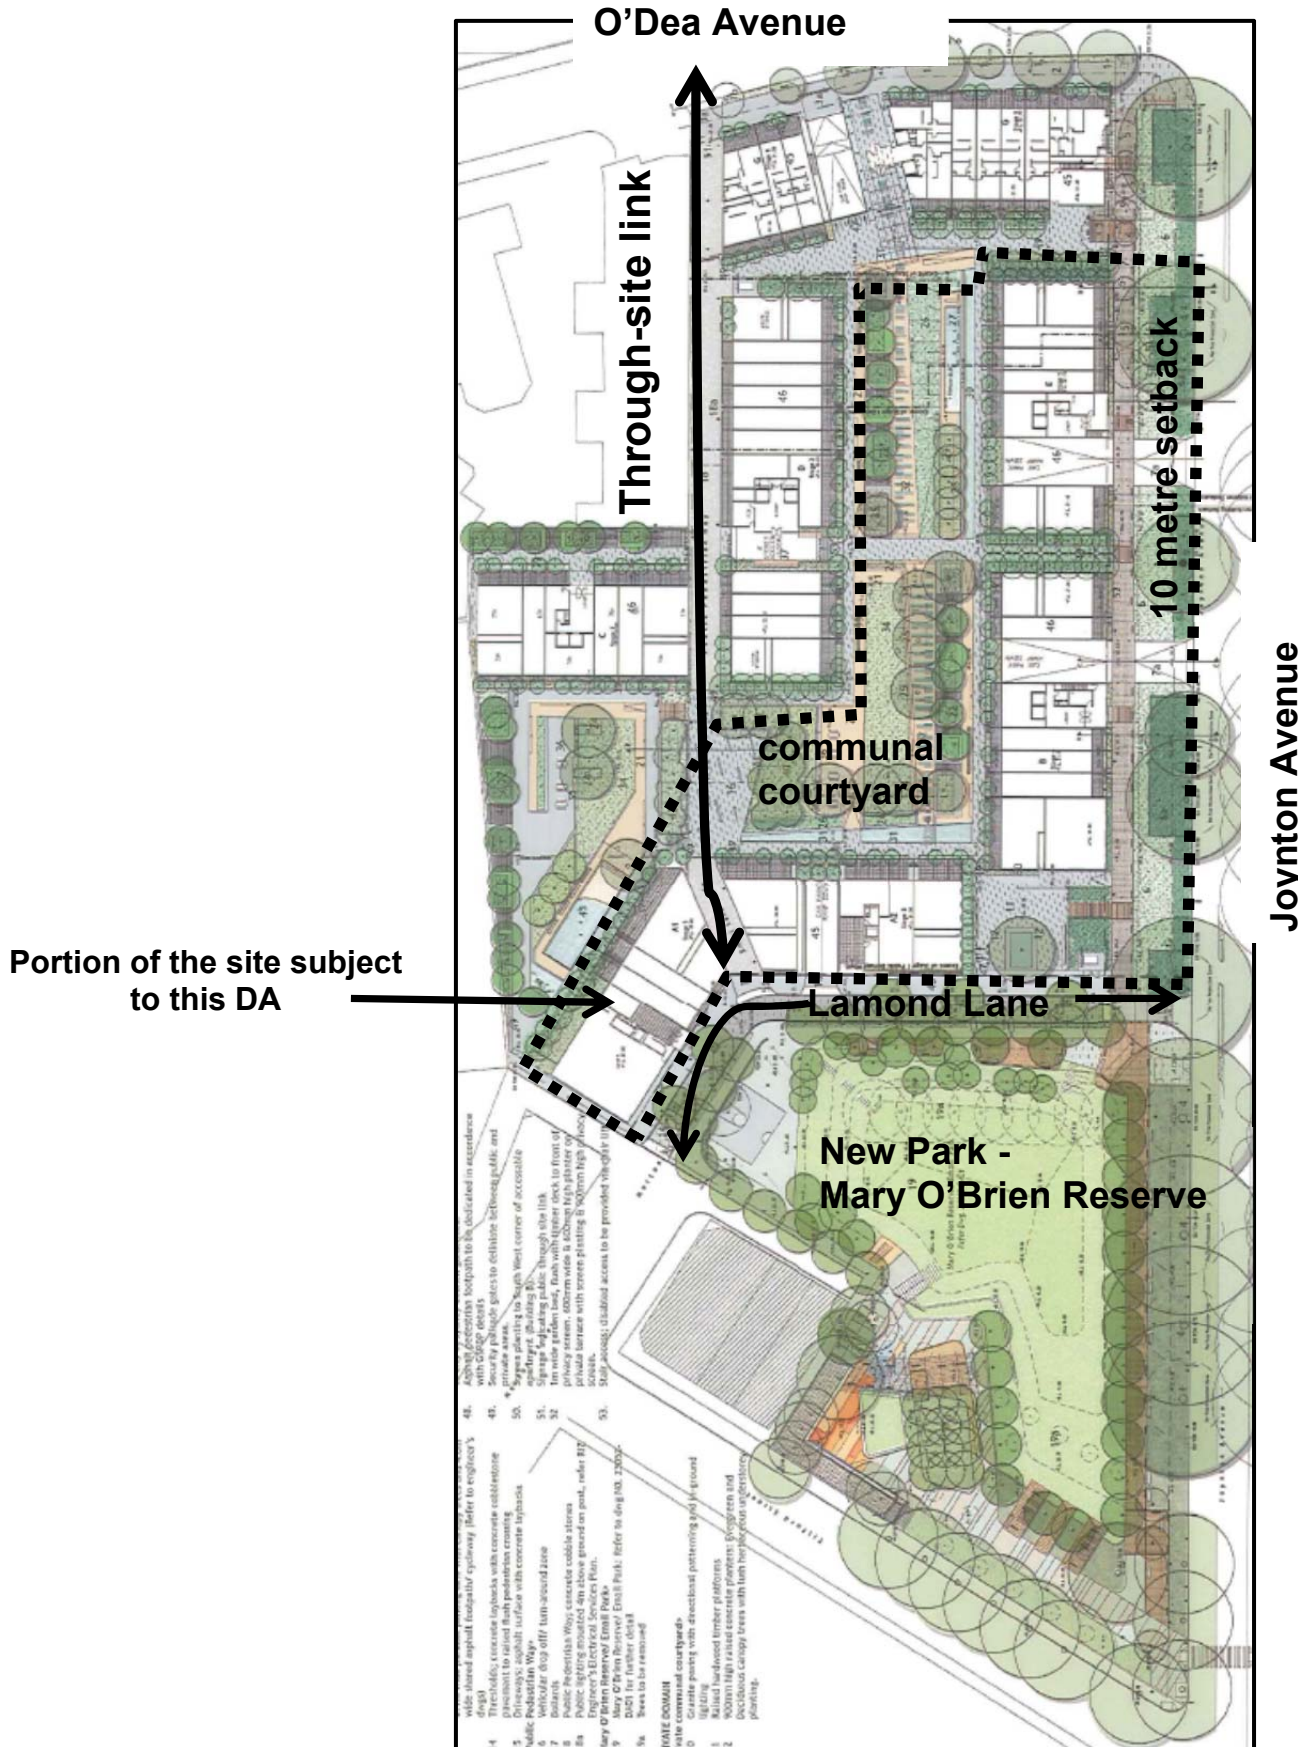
The landscape concept plan approved for the site as part of the Stage 1 consent
